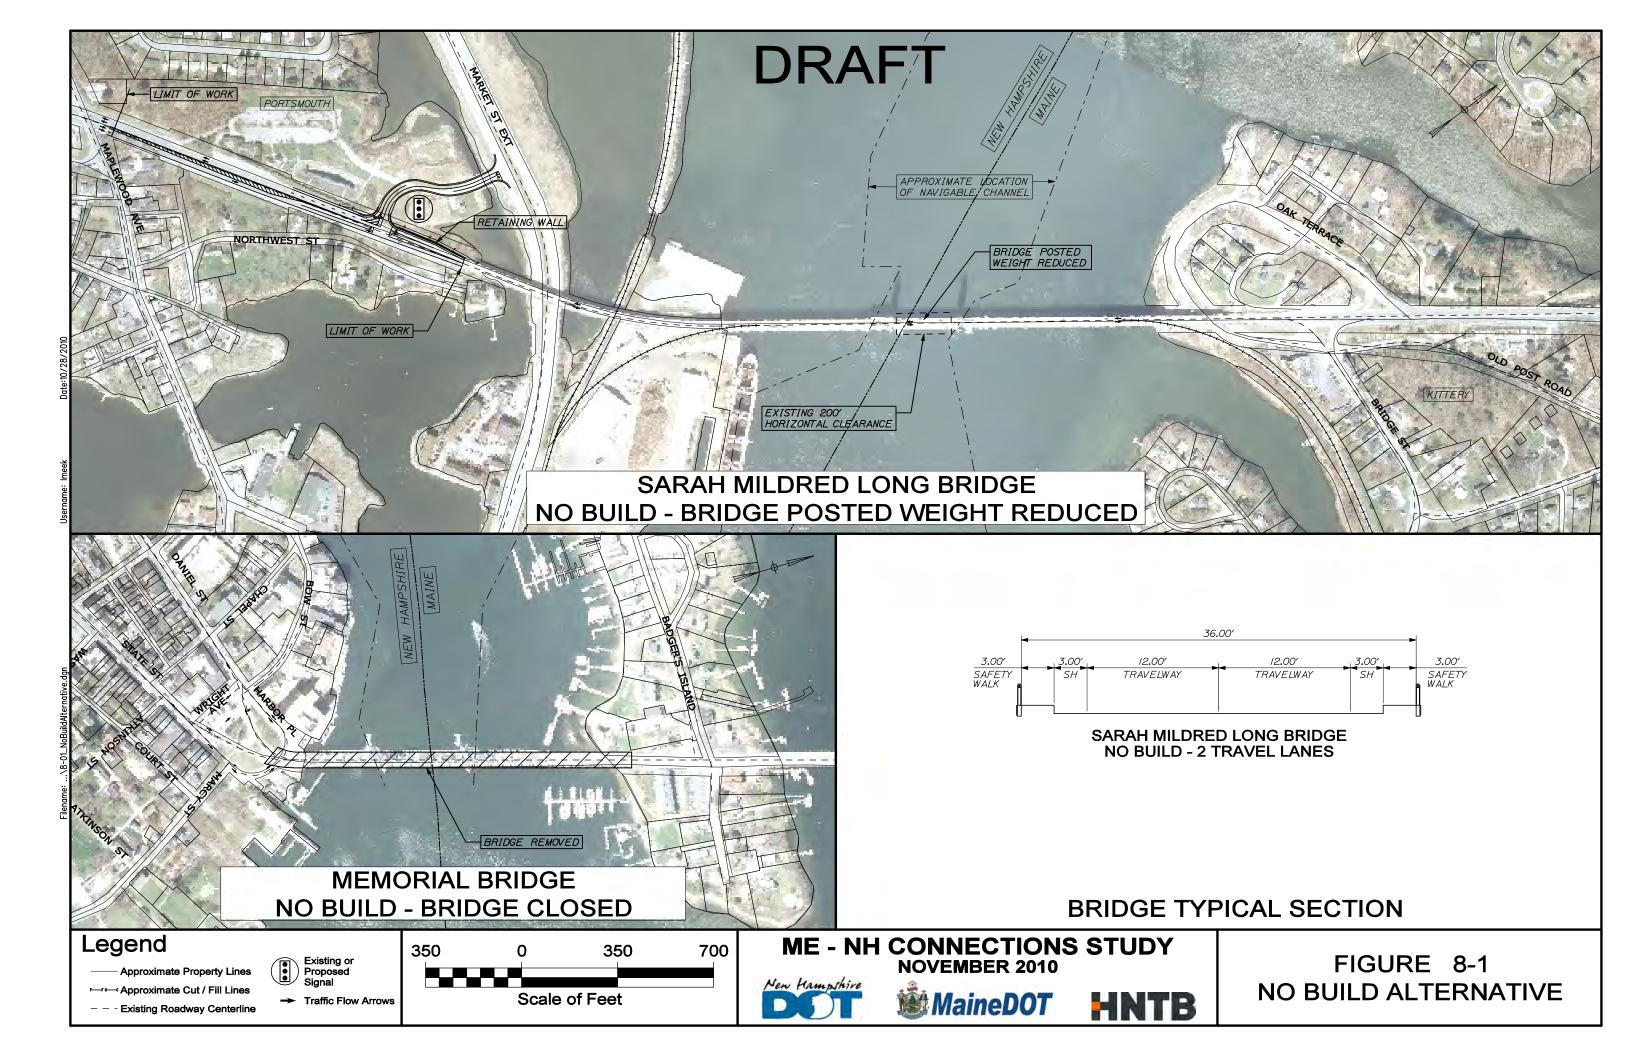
on the following page provides a plan and cross section of the No-Build alternative.
